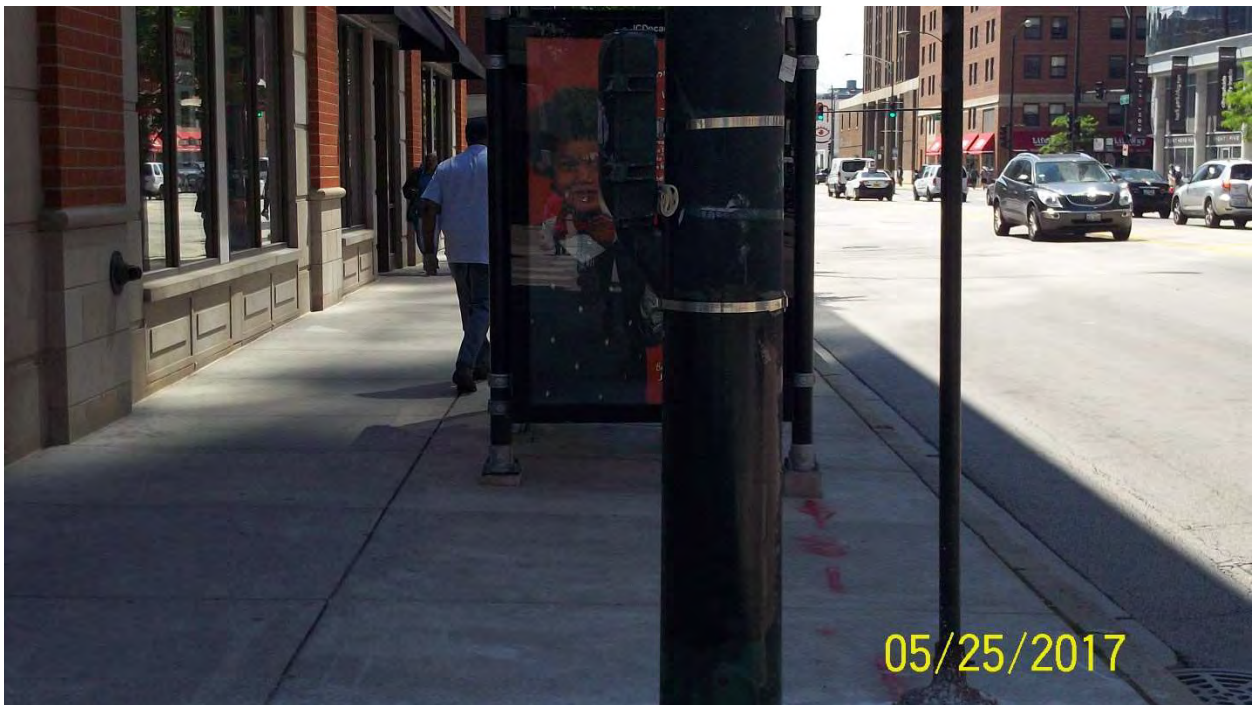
Southwest corner of Chicago Ave. / Clark St. – Looking West
